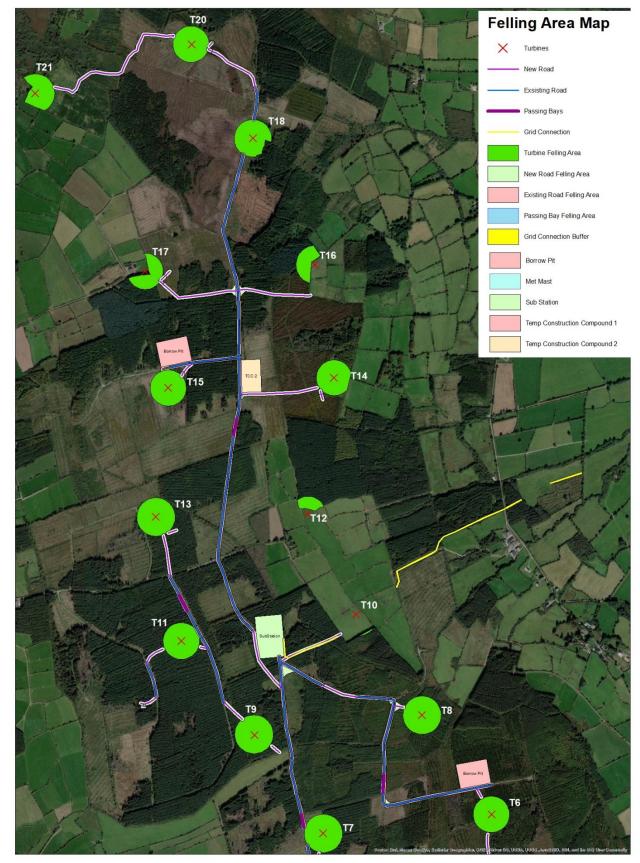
Forest areas to be felled for Turbines 6 – 18 and 20 – 21, borrow pit, mast, substation, passing bay, temporary construction compound, corner widenings and new roads.
